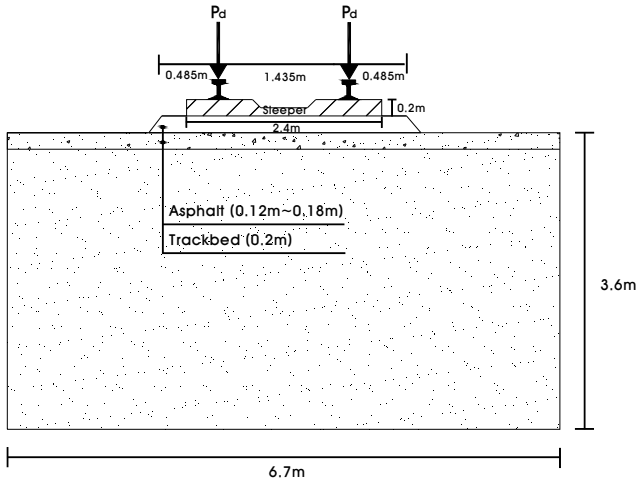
3D finite element modeling of direct fastening asphalt track structure
